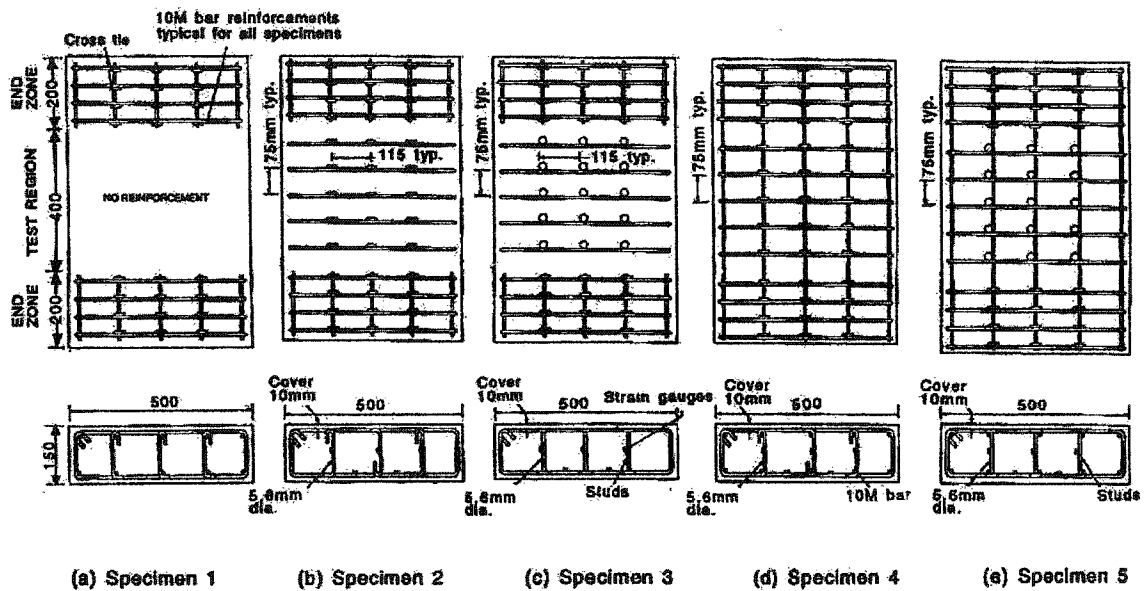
Specimen and their Reinforcement details (after Dilger and Ghali 1997)
